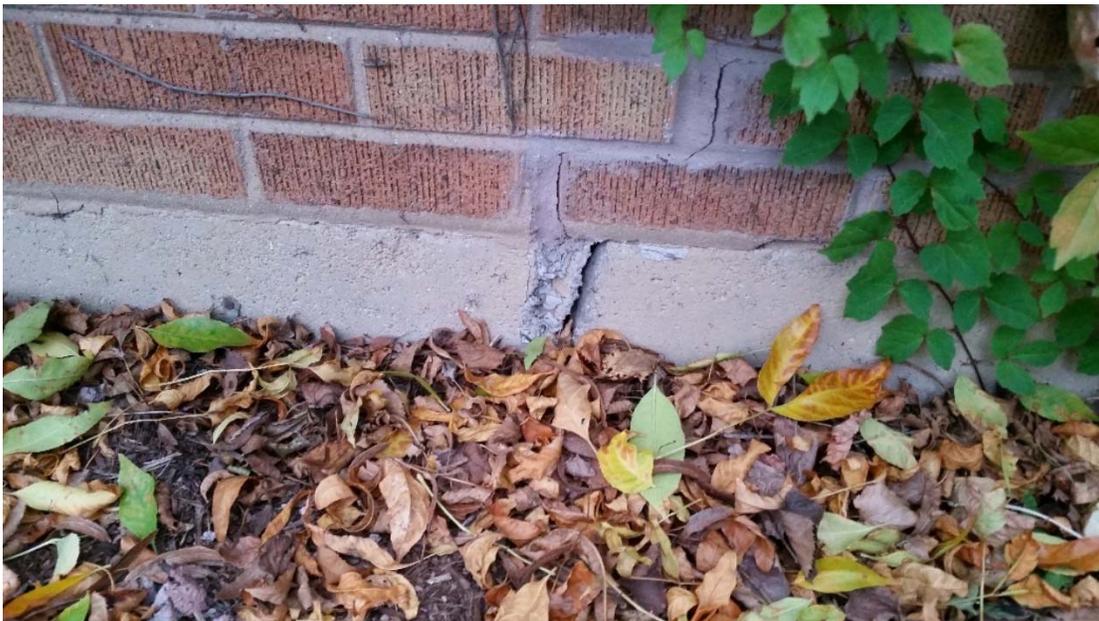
Crack in southwest corner of the house on the west façade
